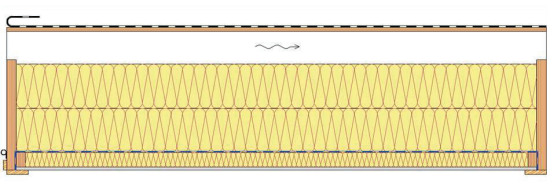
Cross section of roof element supported on glulam beams, such element is dominantly used in Finland, disclosed in LVL Handbook, Figure 2.39 https://proofer.faktor.fi/epaper/LVLHandbook_2020/#76.
